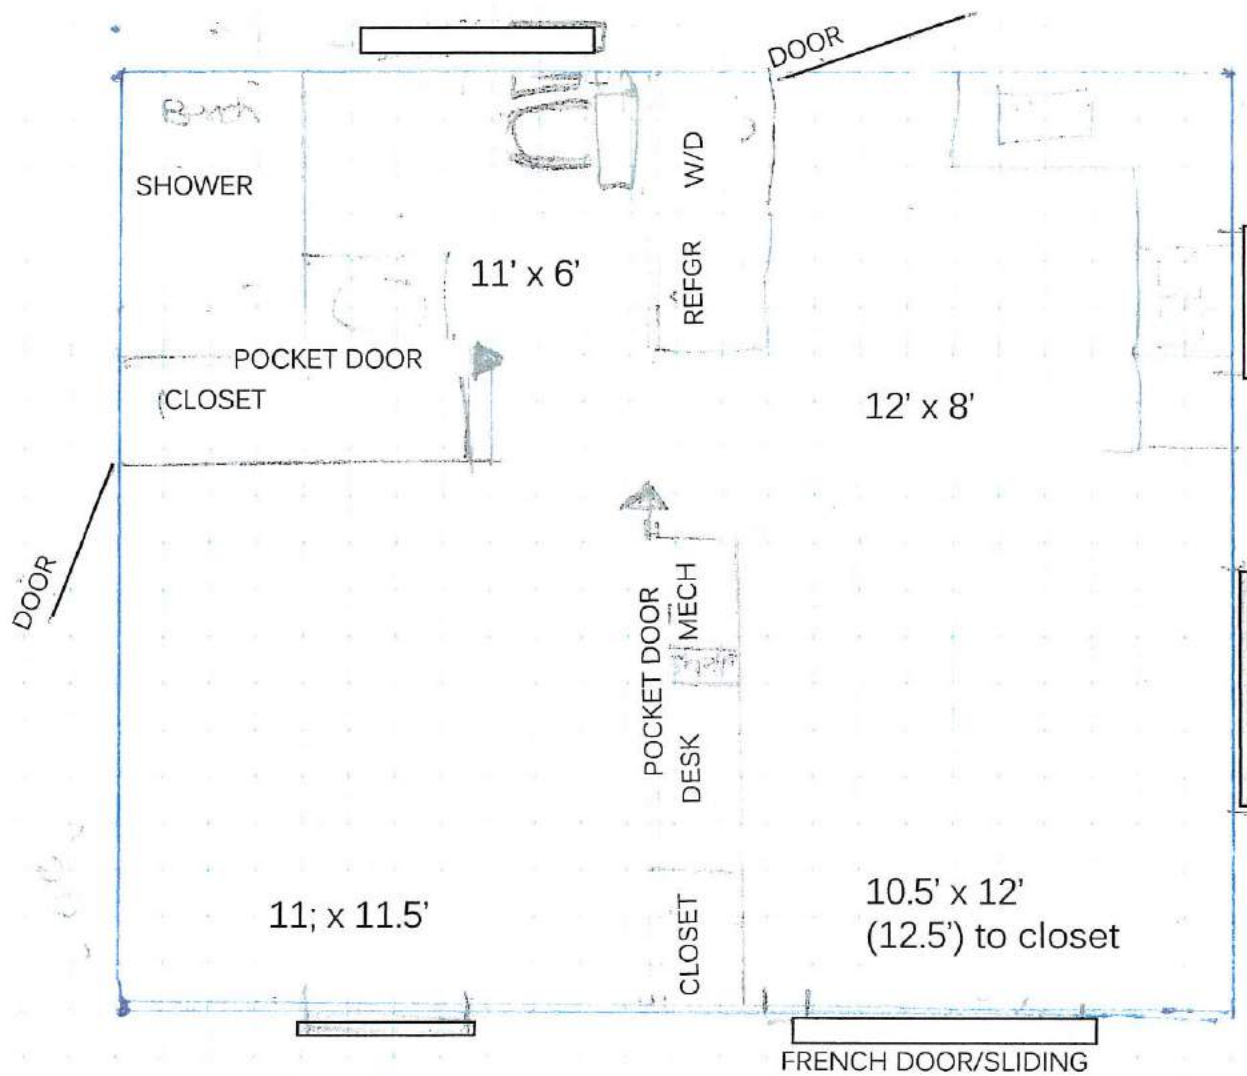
APPLICATION, SITE PLAN, ELEVATION
